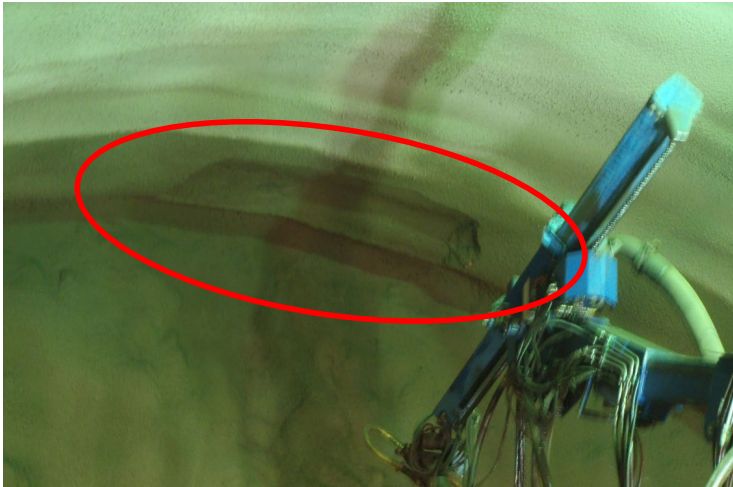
Photograph showing area where sprayed concrete has fallen from tunnel crown, cause unknown but likely sprayed concrete failed under own self-weight (photograph Nicholas Trussell)
